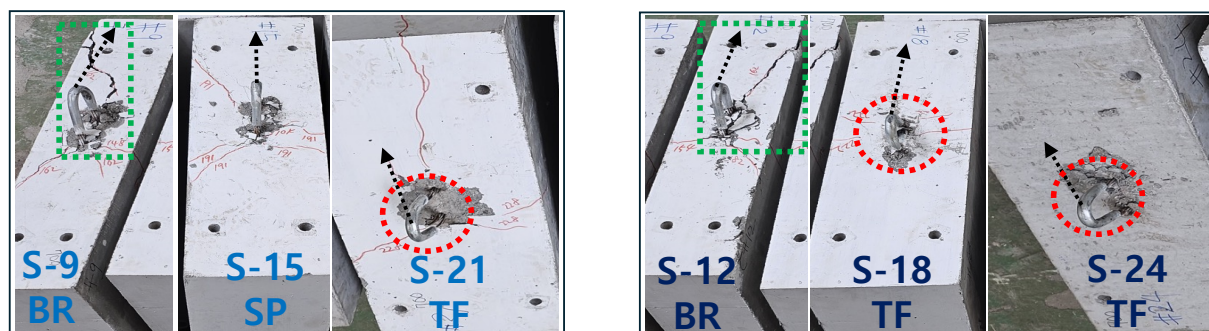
Failure modes (embedment depth of 450 mm). BR = breakout failure of the concrete; S-9 = specimen 9; S-12 = specimen 12; S-15 = specimen 15; S-18 = specimen 18; S-21 = specimen 21; S-24 = specimen 24; SP = splitting rupture of the concrete; TF = tensile failure of the strand. Note: 1 mm = 0.0394 in.
